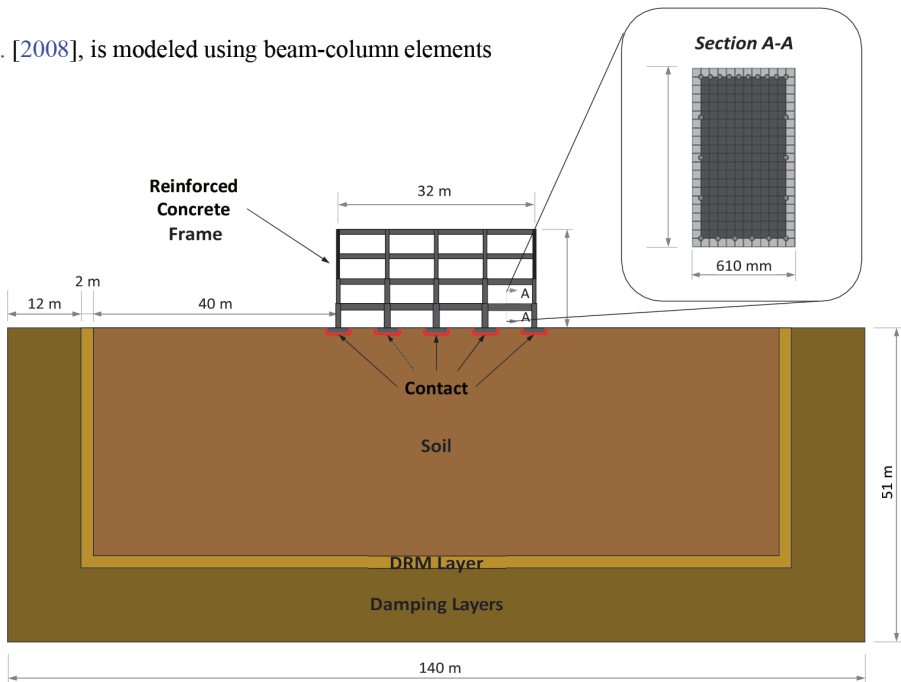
Numerical model of the reinforced concrete frame, inelastic soil, and foundation-soil interfaces
